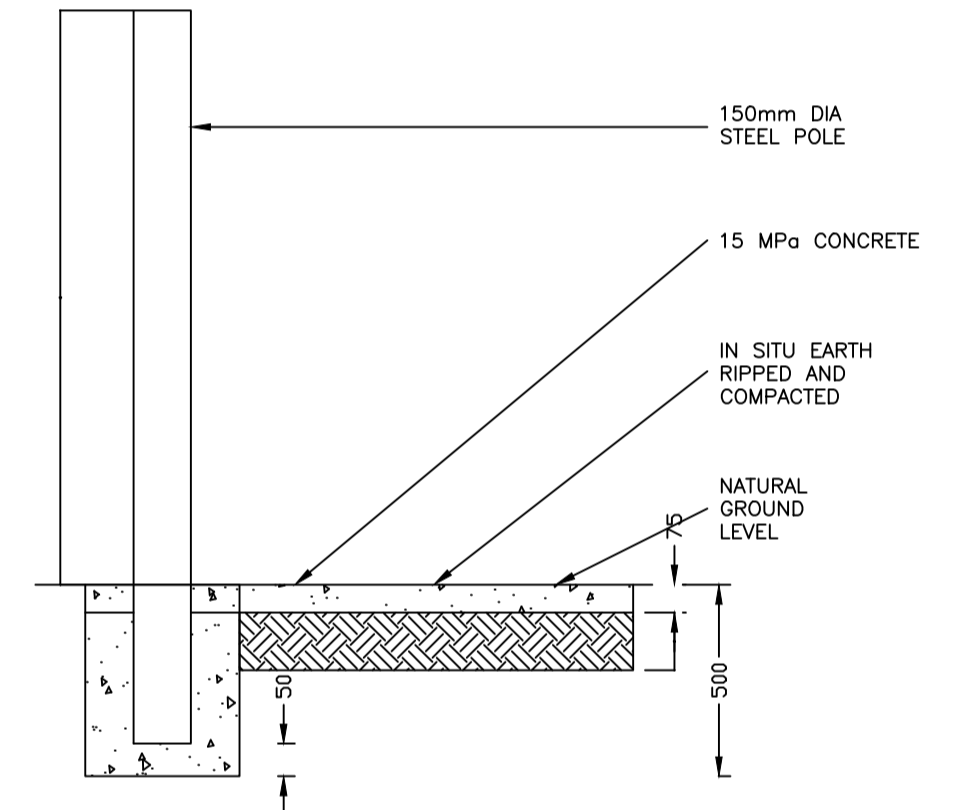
F: PLAN FOR FOOTING TOTEM/CANTILEVER POLE
